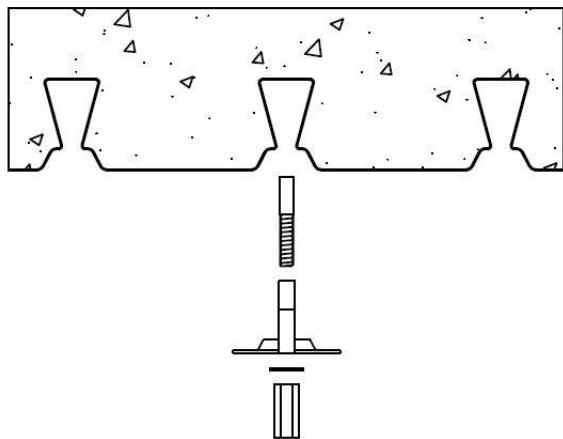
Ankore Hanger Installation Details for Floor Deck
